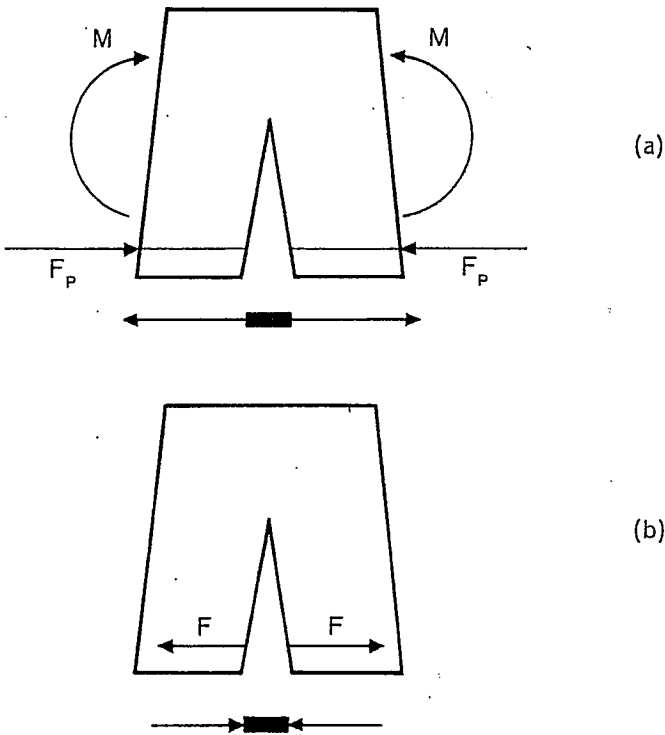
Statical Schemes: (a) Under Loading; and (b) After Unloading for Reinforced Beam Cross Section
